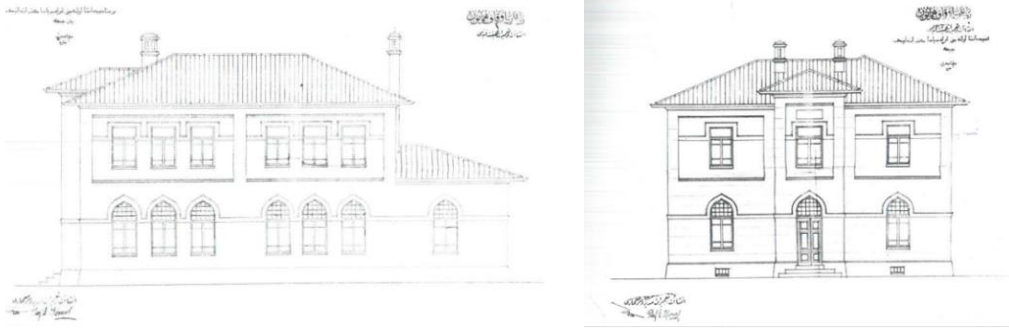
a) İbrahim Paşa Primary school Side Facade, b)İbrahim Paşa Primary school Front Facade [42]
